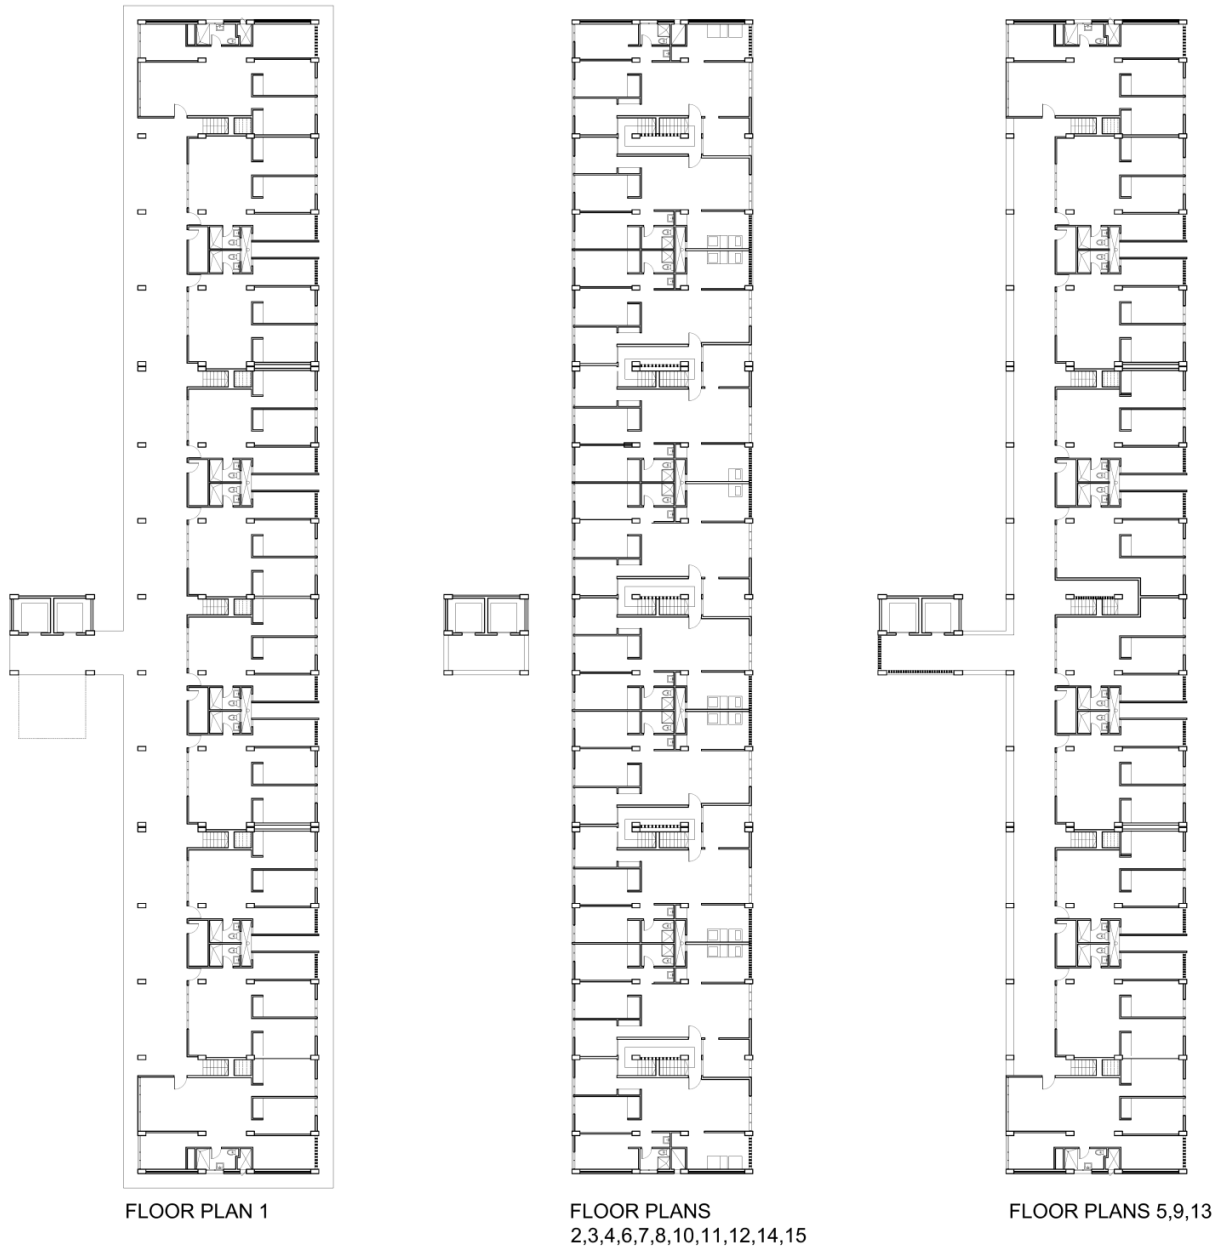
Floor plans of the superbloque Diego de Losada (modified 1956) Redrawn from the information available
